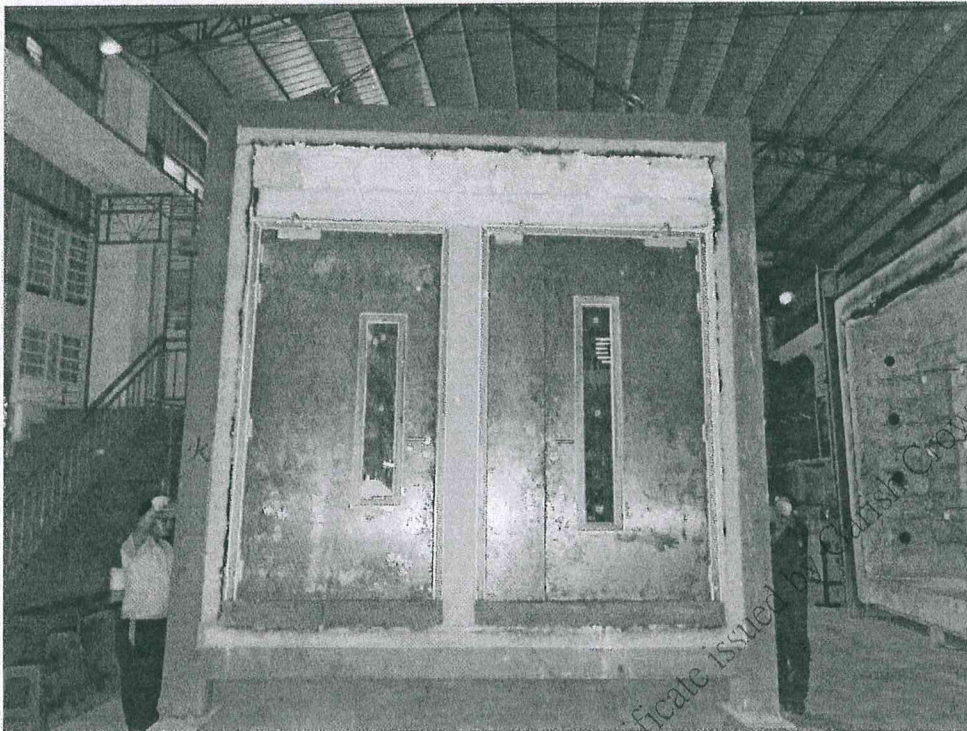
Exposed surface of the specimen before test. (Left: Door B; Right: Door A)
